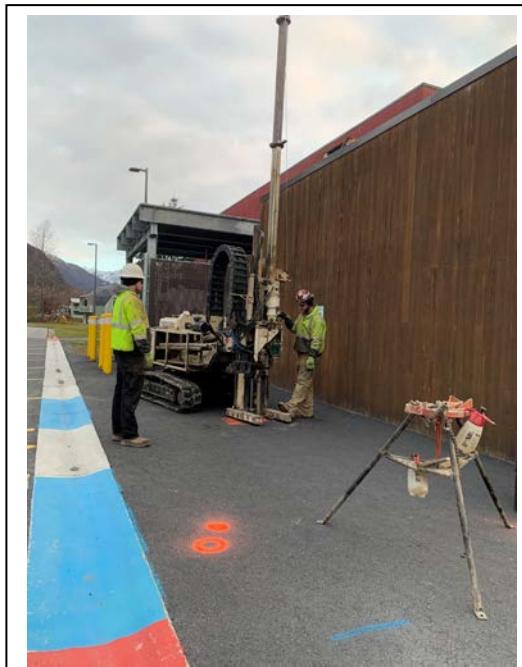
Looking northeast at the advancement of Boring B2. (October 20, 2019)
